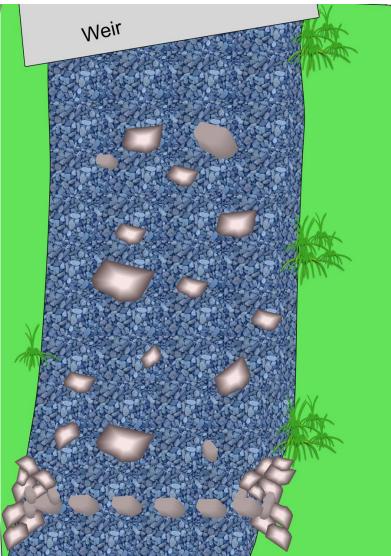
Plan view impression of rubble mat – including downstream retaining stones. Note the bank protection shaped to avoid erosive eddies via inclusion of upstream-angled downstream. Flow is from the top of the frame downwards.
